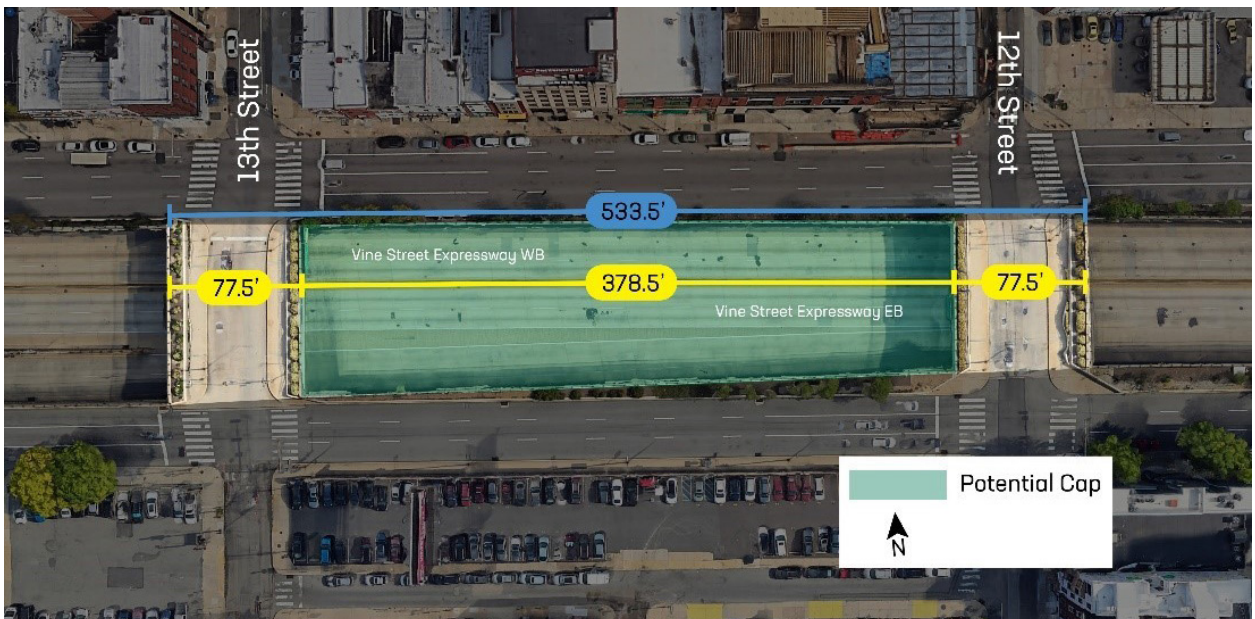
Measurements from 12th Street Bridge to 13th Street Bridge
